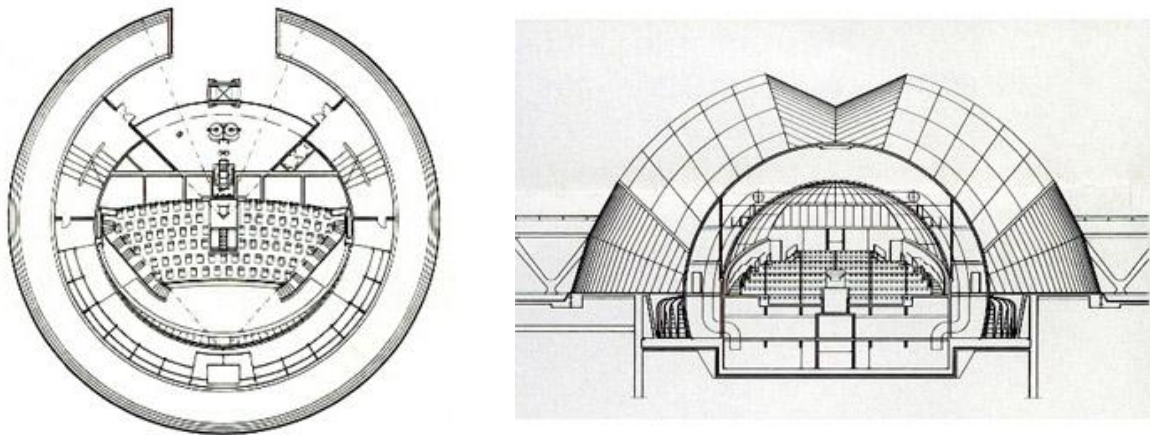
(a) Plan of the planetarium, (b) Transverse Section<sup>23</sup>
